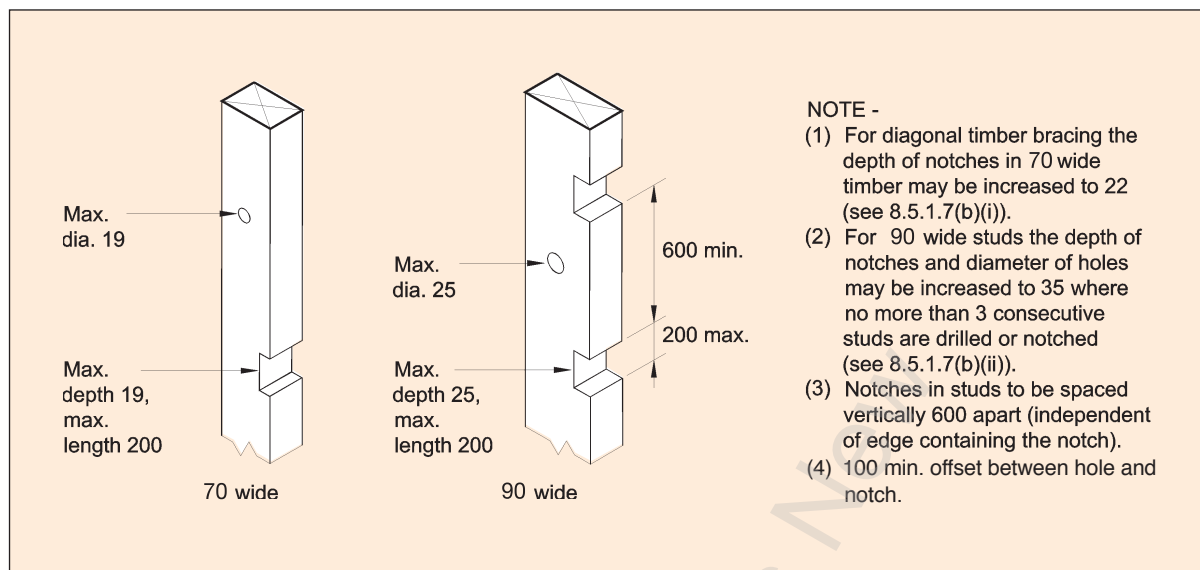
Checking and boring studs (see 8.5.1.7)
